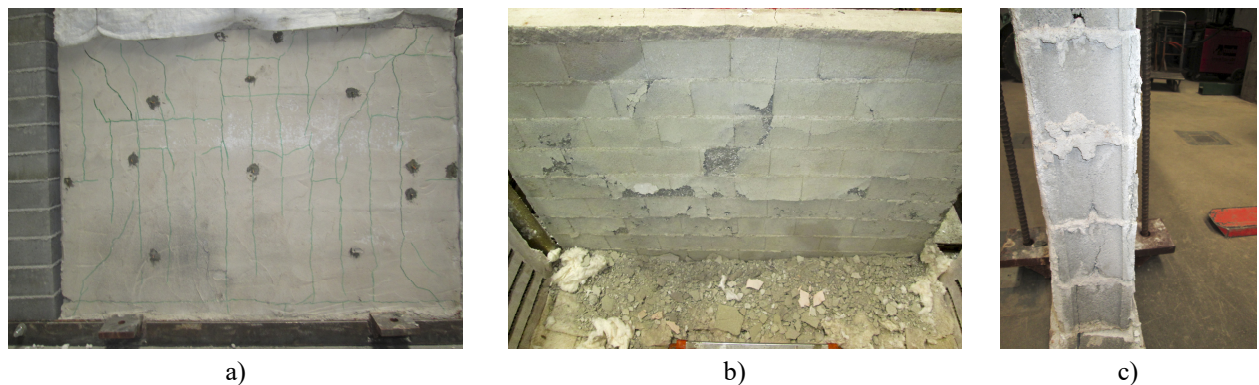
Specimen 2 – a) crack pattern of the fire unexposed face; b) spalling on the fire exposed face c) vertical cracks on the width wall of the blocks
